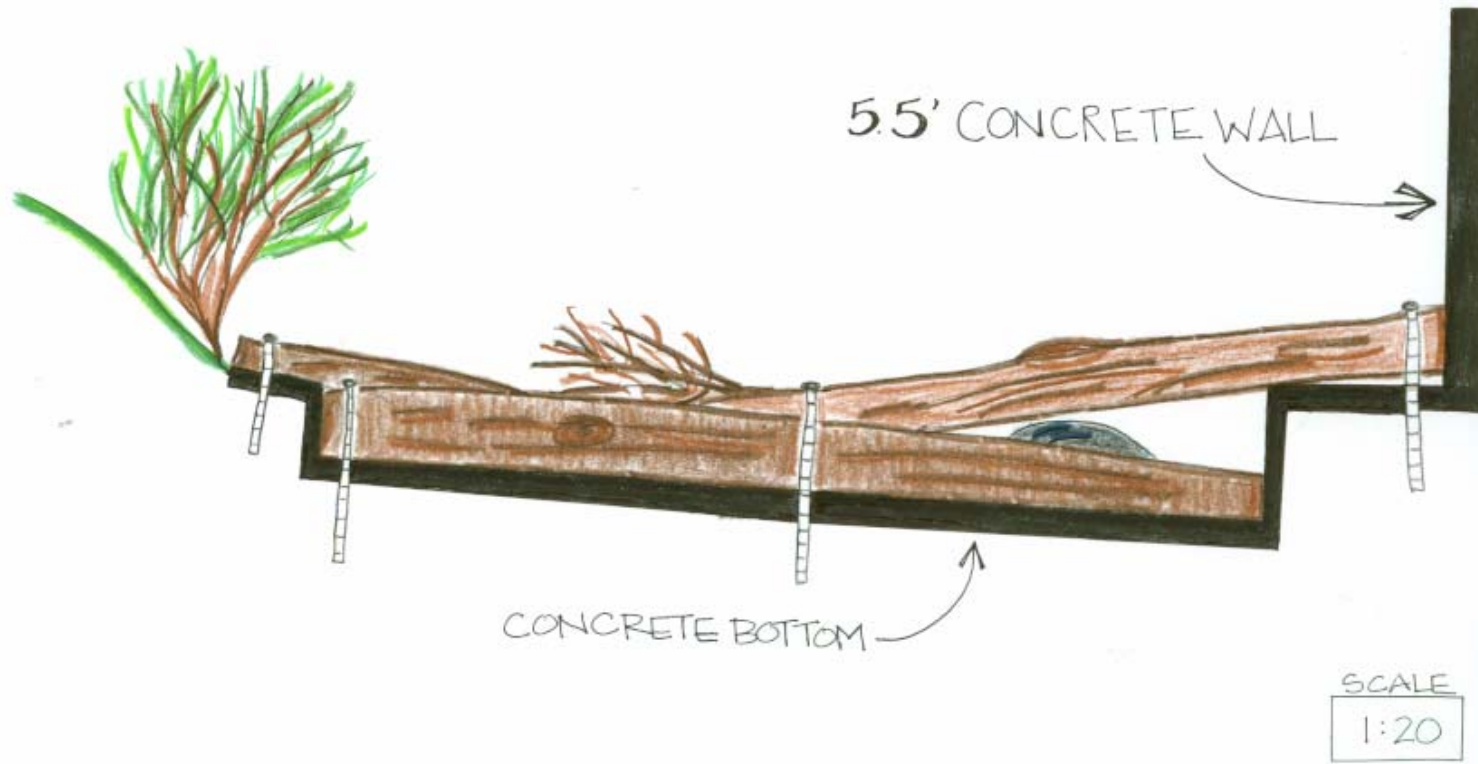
Typical section view of engineered log structure to be installed downstream of the concrete section to modify the existing barrier.
